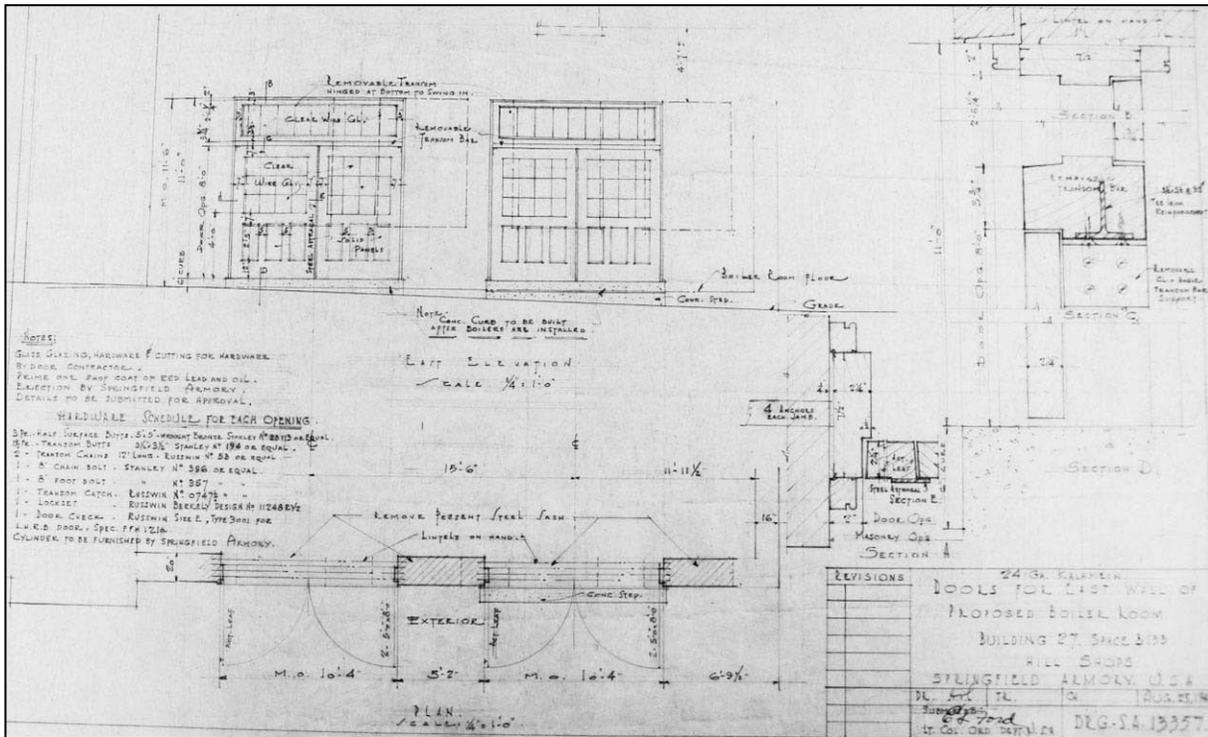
24 Ga. Kalamein Doors for East Wall of Proposed Boiler Room, Building 27, Space B-133, Hill Shops, Springfield Armory, U.S.A., August 23, 1941; not to scale.
